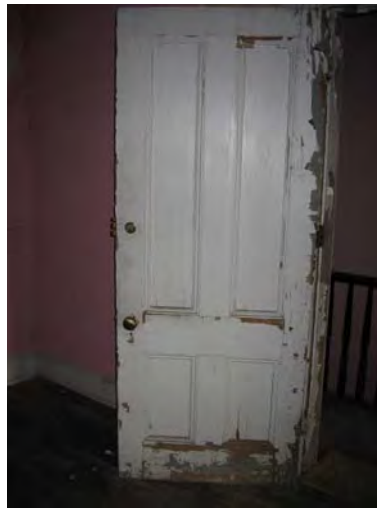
Door D305 – room 301 elevation. (Photo: BBB, 2007)
